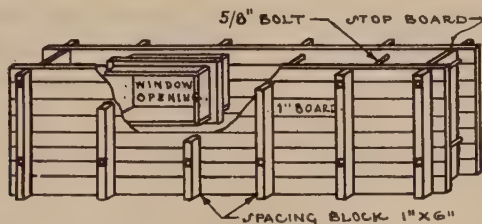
Sectional wall form for carrying wall up vertically with minimum amount of lumber.
